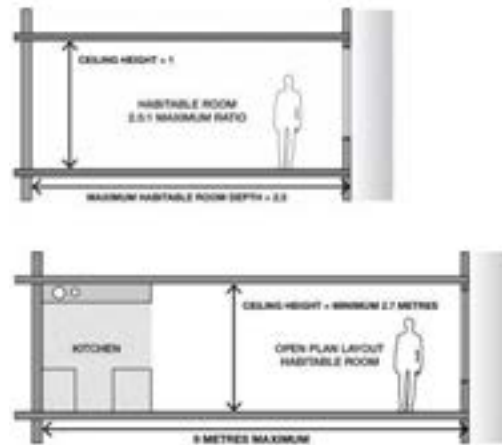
Room depth and ceiling height dimensions (Source: DELWP 2016, p.15)
